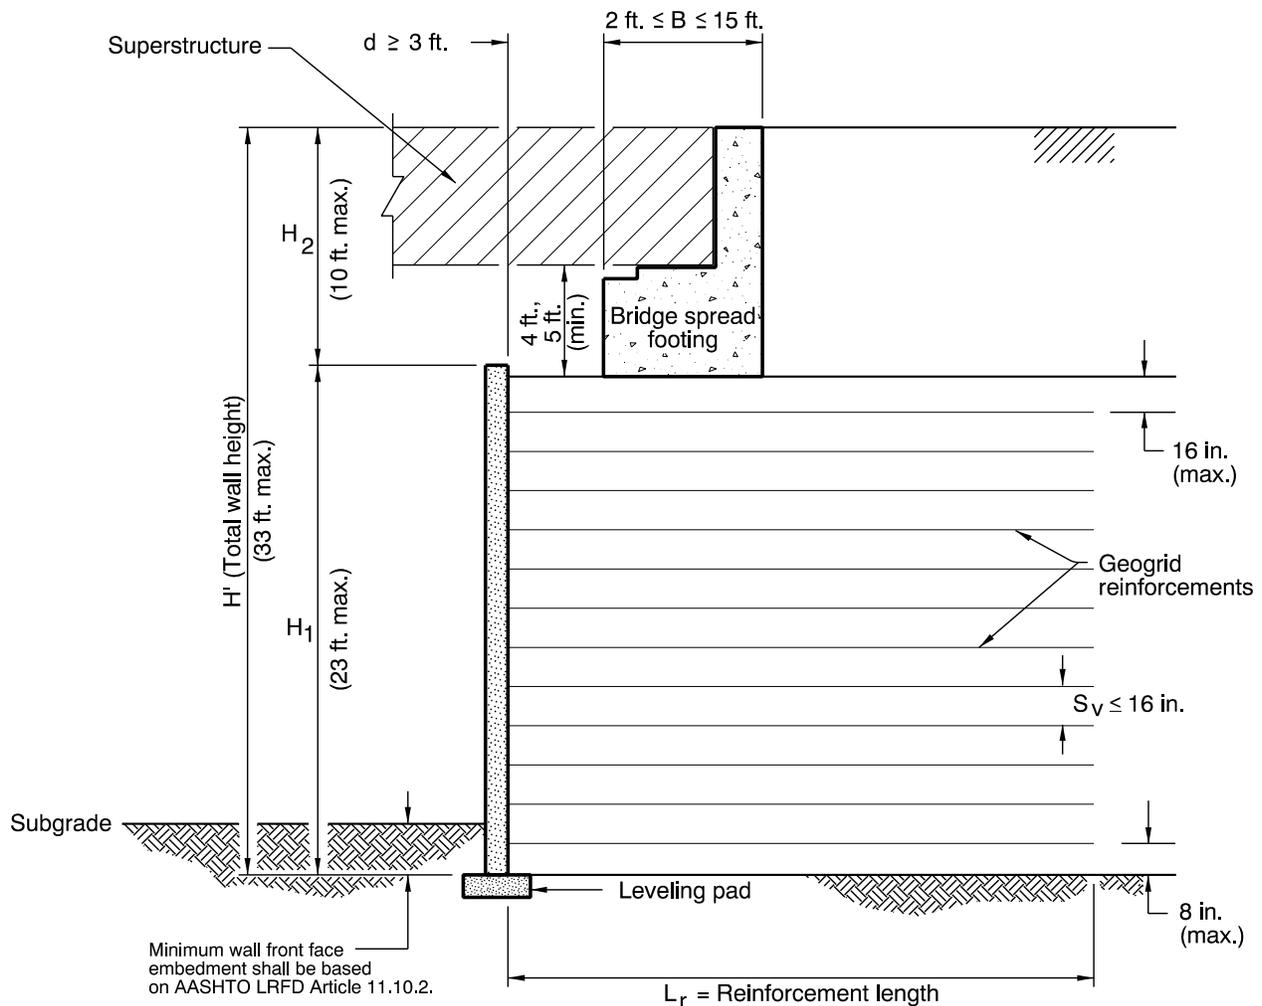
MSE Wall Supporting Bridge Abutment Spread Footing (Geogrid Reinforcements)
